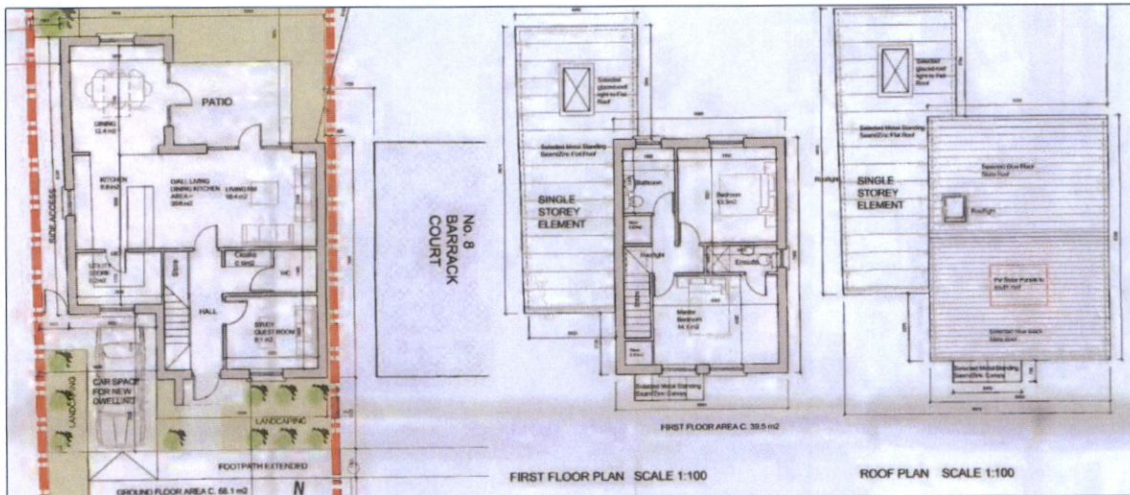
Floor plans refused under Reg. Ref. SD19A/0128 and ABP Ref. 307316-20.
